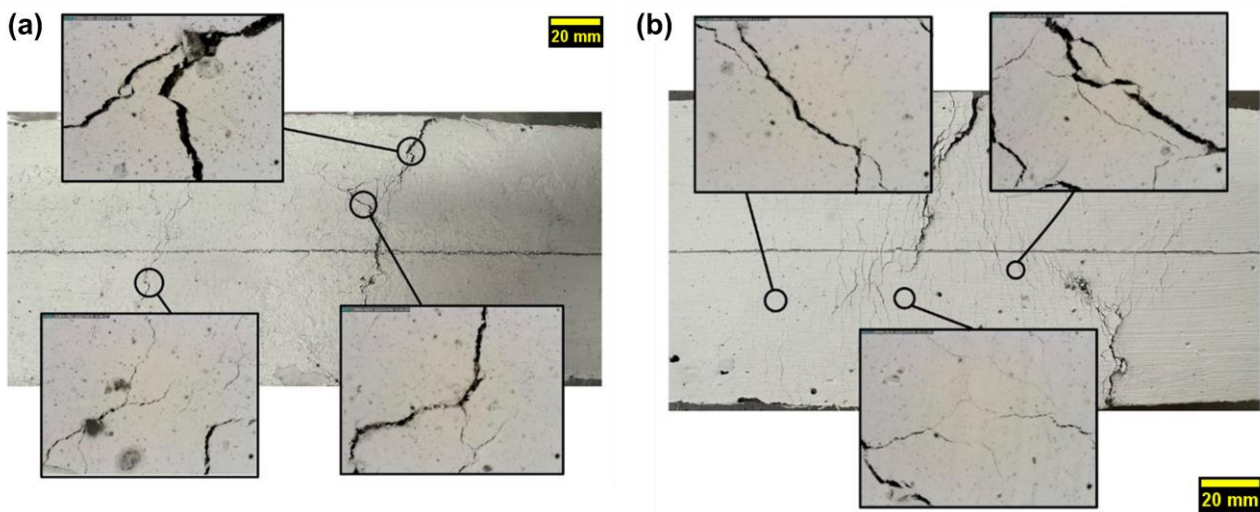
Typical microcracks on the tensile side of CR10: (a) front view and (b) bottom view.
